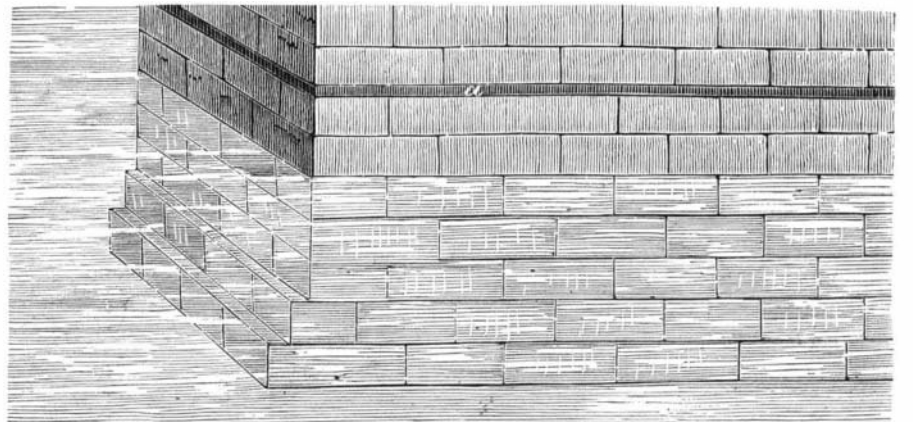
WALL CONSTRUCTED IN THE WATER.
